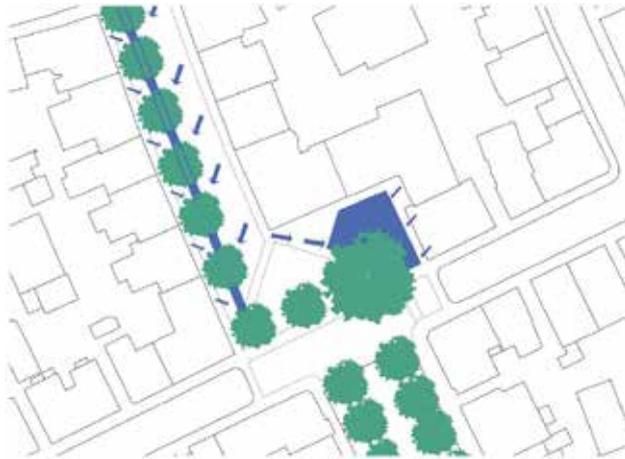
Schematic Water-management Plan - Wasserschema Plan
